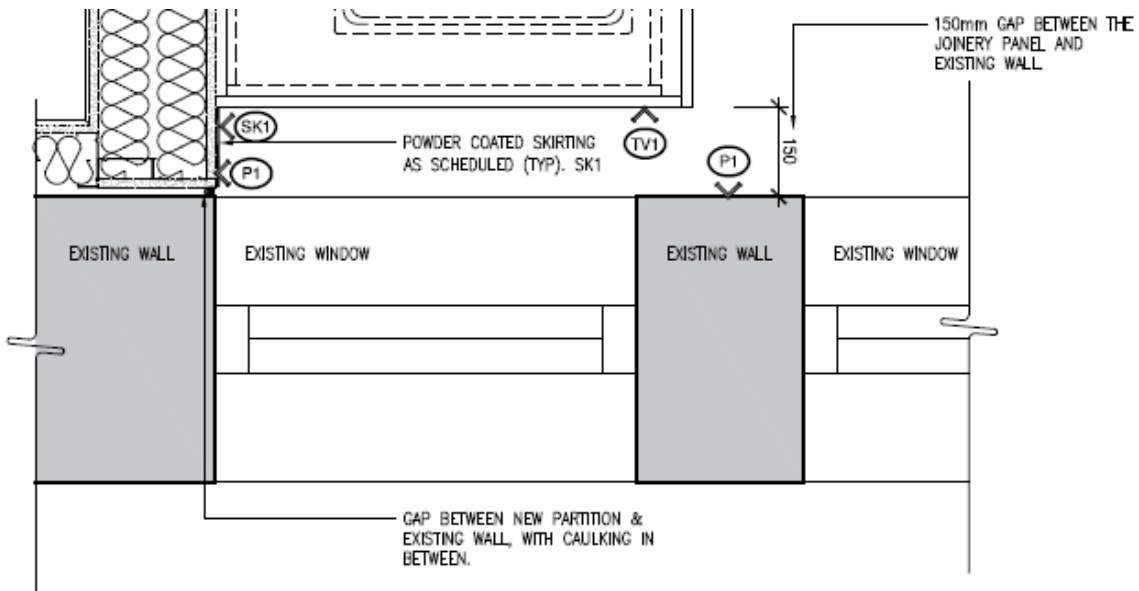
Detail of the proposed connection of the amenities pod and kitchen bench to the external west wall at ground level; Plan Detail P02
